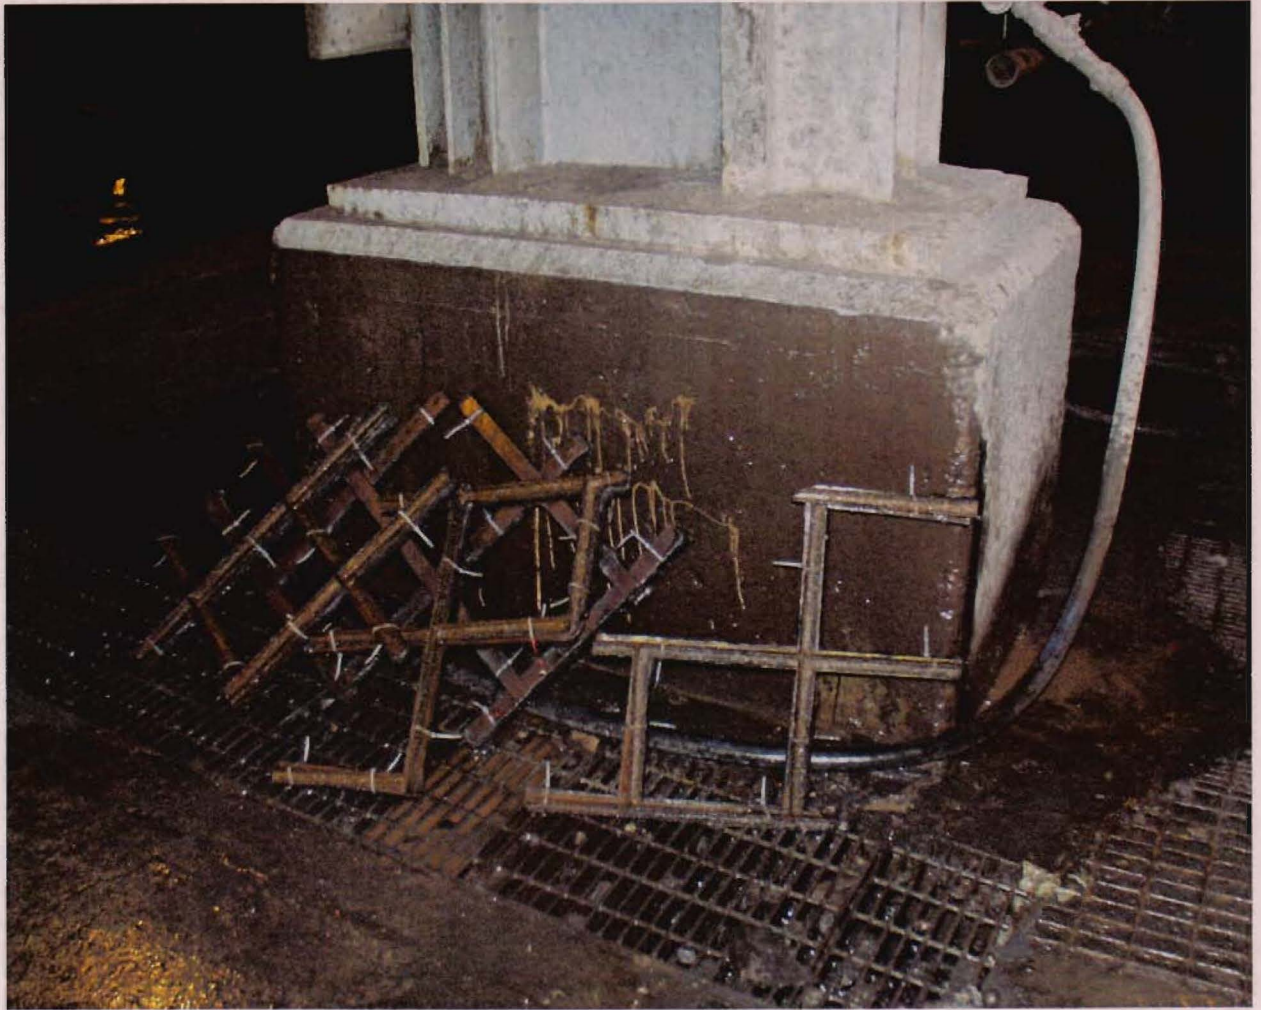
Sections of Magnet Assembly Awaiting Installation into Test Unit
